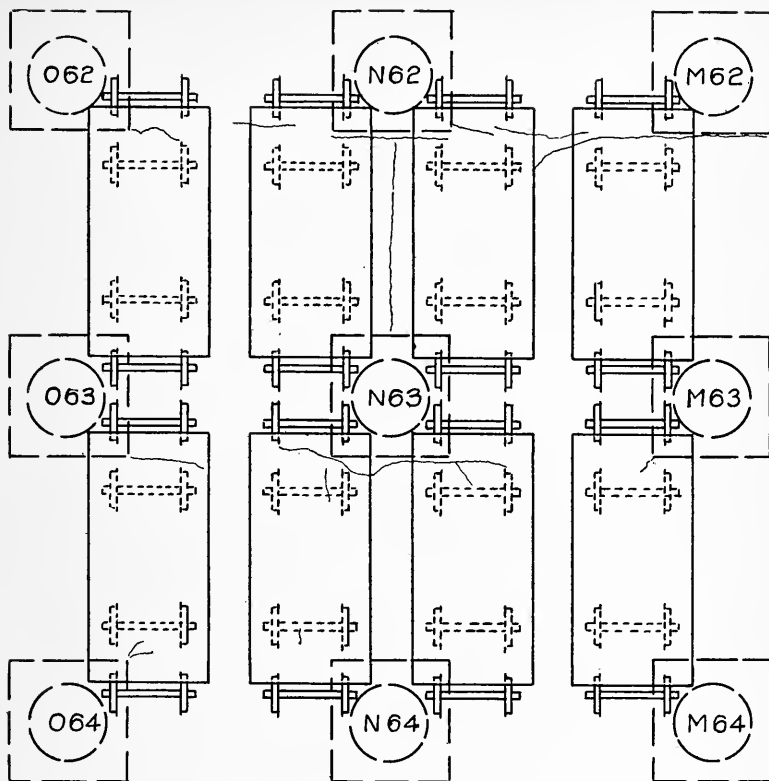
LOCATION OF CRACKS IN SOO TERMINAL TEST FLOOR.
